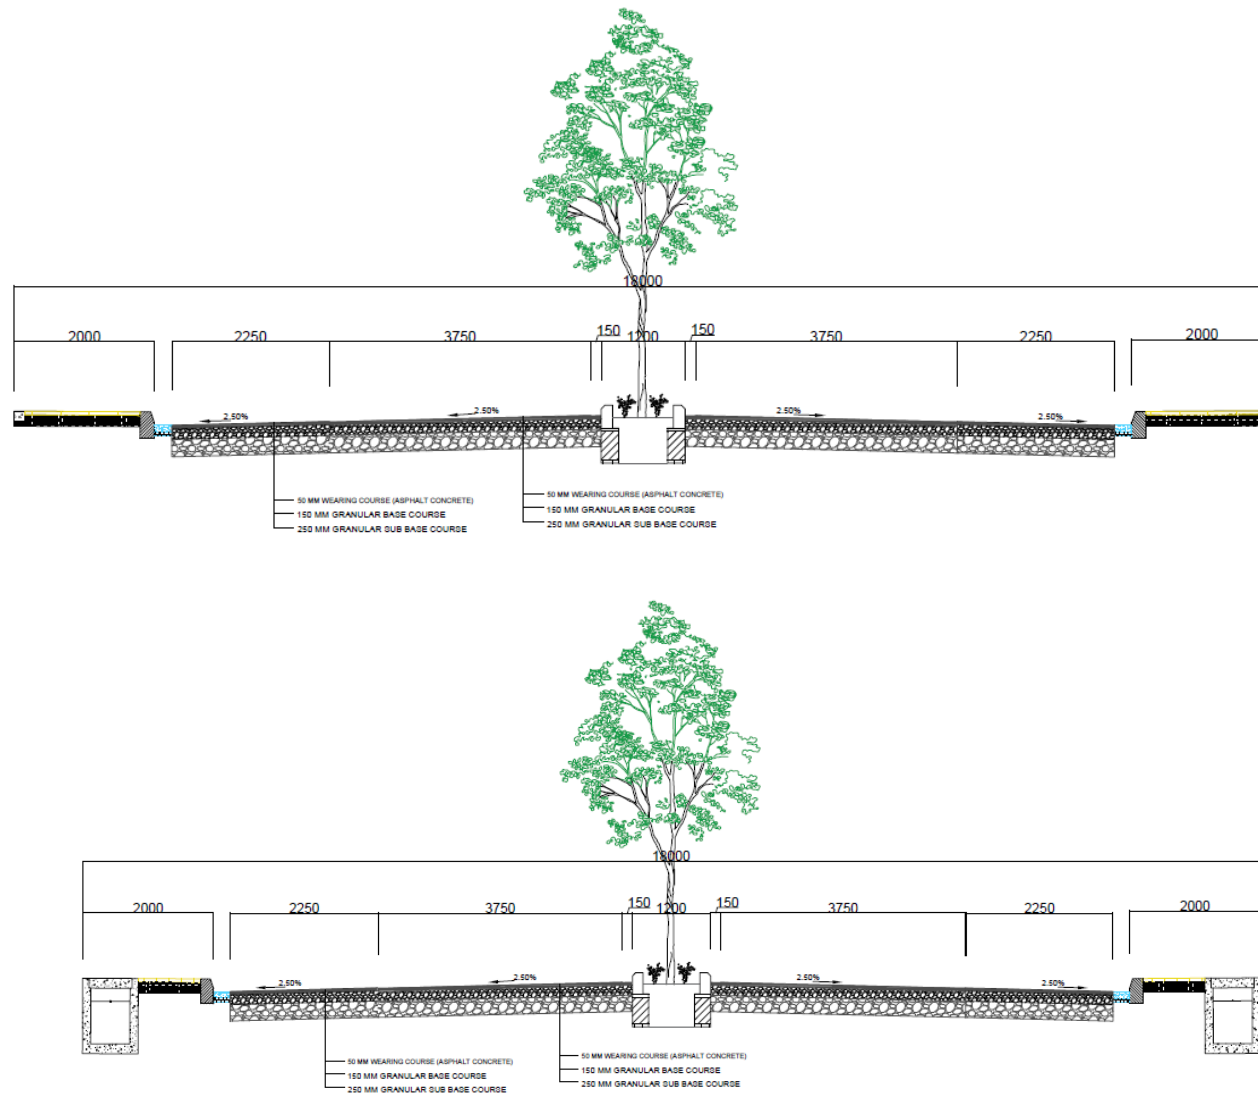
Typical Road Sections with Footpath, Drain and Retaining walls (8.0m)
